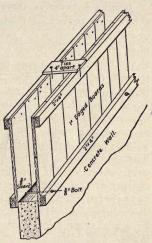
Wall Mold, Central Felt & Paper Co. Factory.
